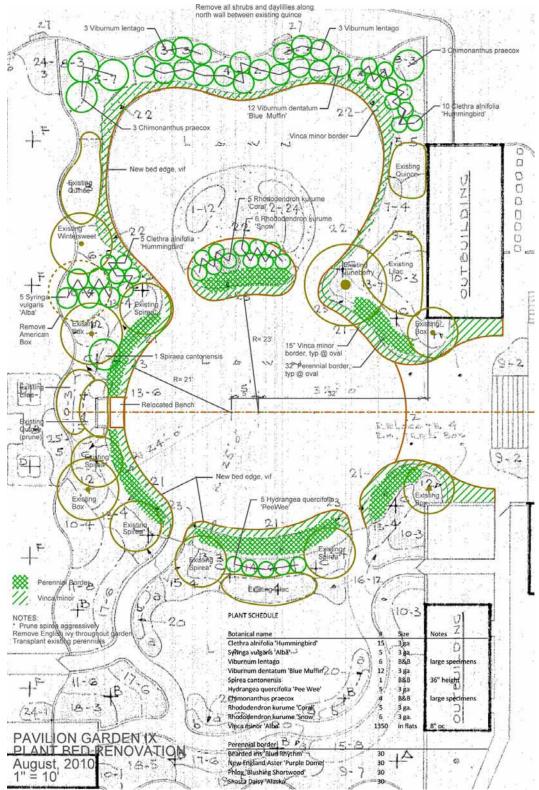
Work on the upper Pavilion IX garden, West Gardens, was required after the removal of the McGuffey Ash that had stood in this location since 1826. The plan shows proposed plantings. (R-JAV-OA-LP-2010-08-M-4-UpperPavIX.jpg)
